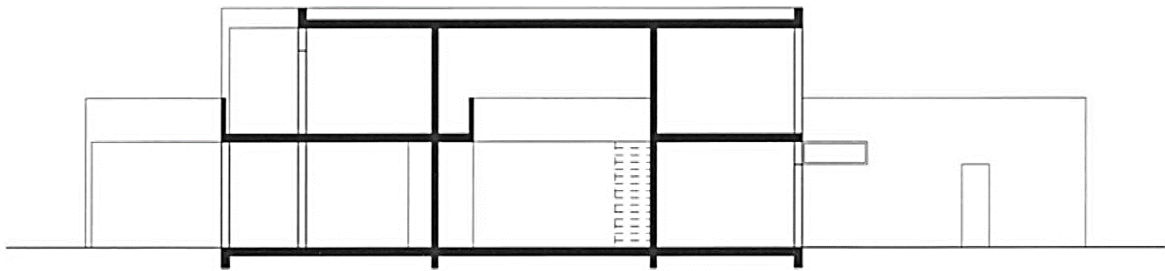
Housing group Kranichstein, longitudinal section, East-west orientation
